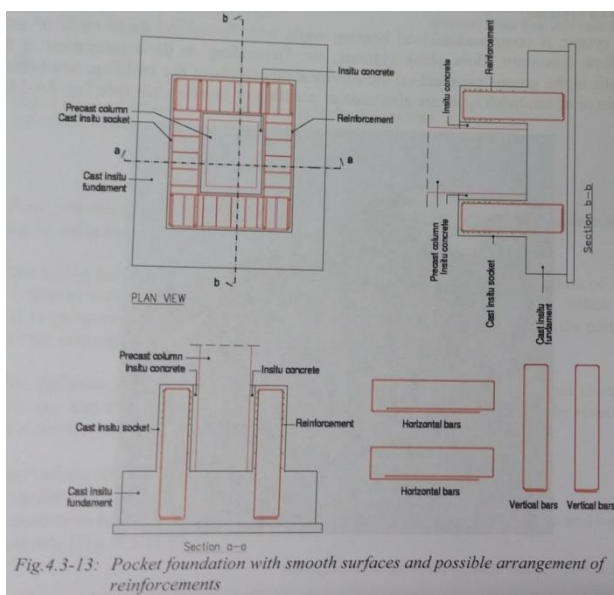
Pocket foundation with smooth surfaces and possible arrangement of reinforcements
